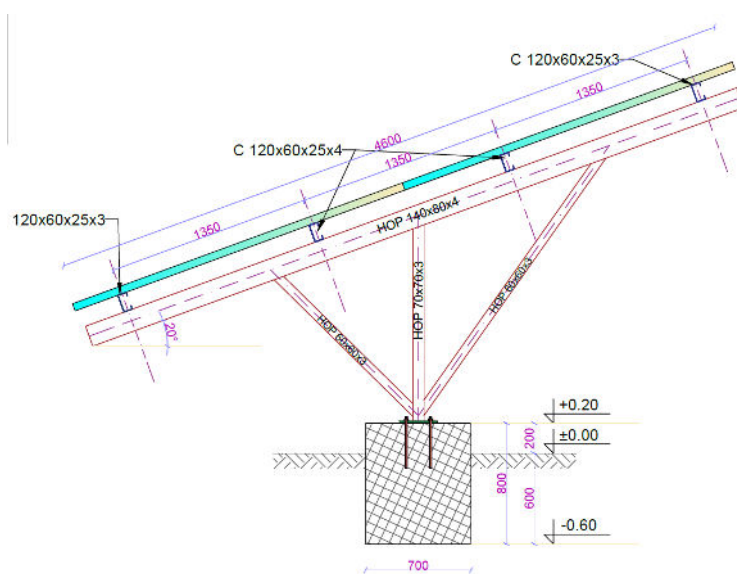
Dimensions of the steel structure for solar panels and foundations
